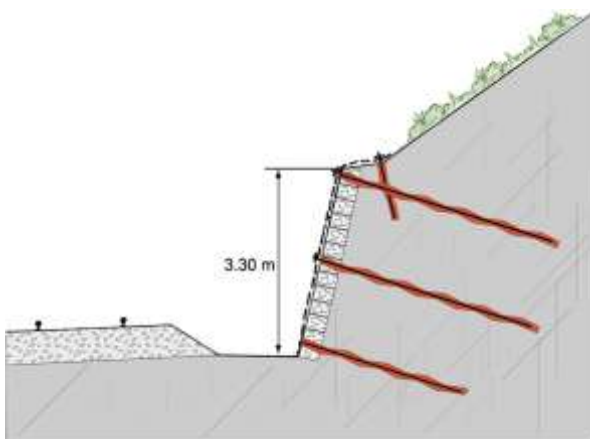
TECCO® slope stabilizations incl. greening for SAMSUNG in Korea
